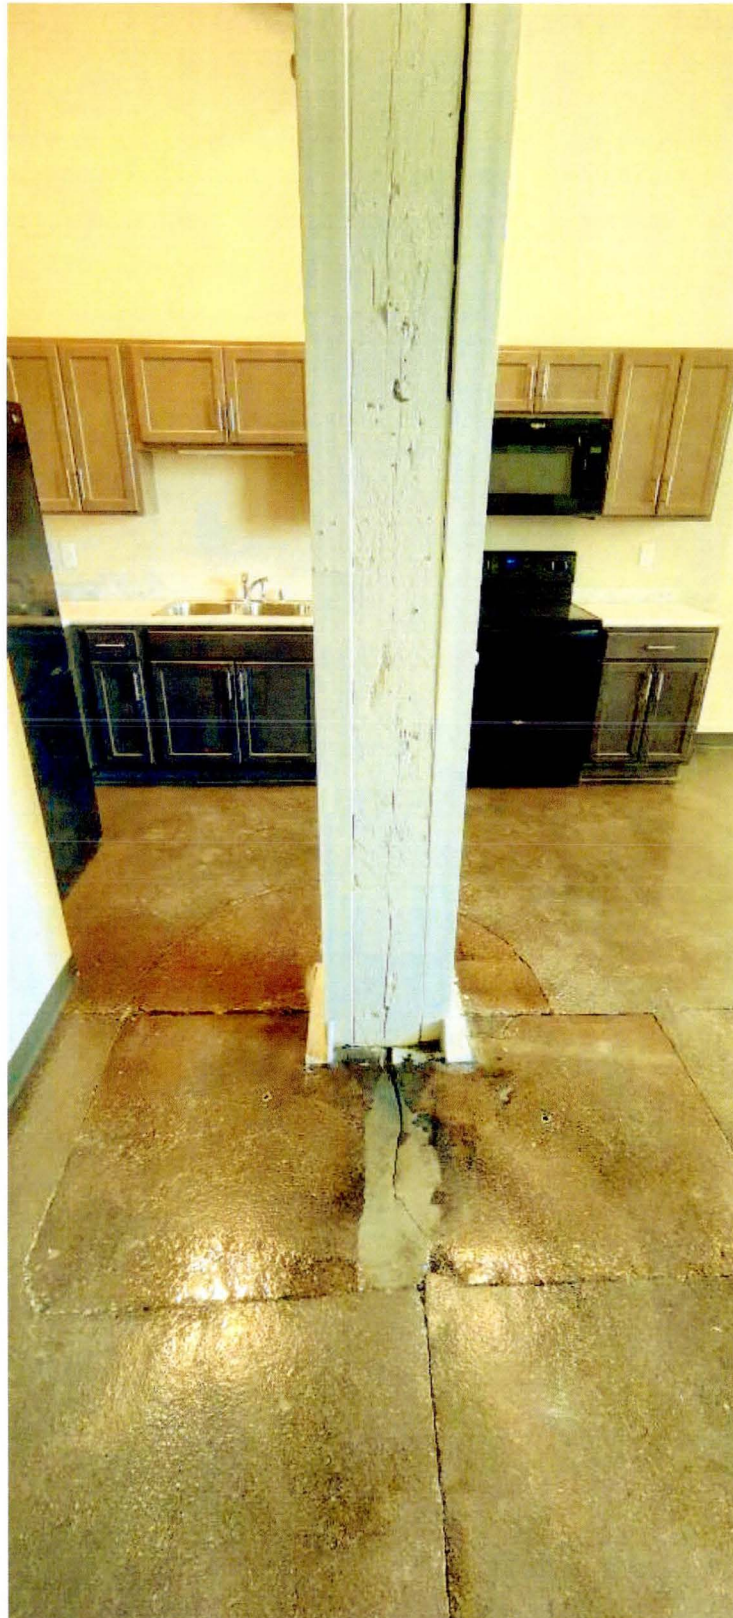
Unit 1026 - Wooden Pillar and cracks in the living room
